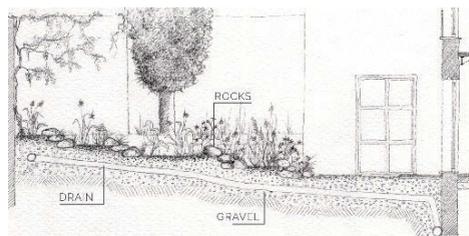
Cross section of garden proposal (V. LiPuma, 2021)
